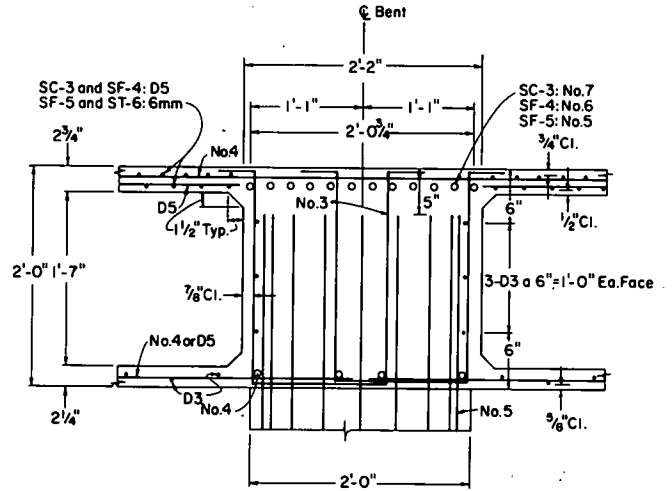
Section of Bent Cap of Specimens SC-3, SF-4, and SF-5
